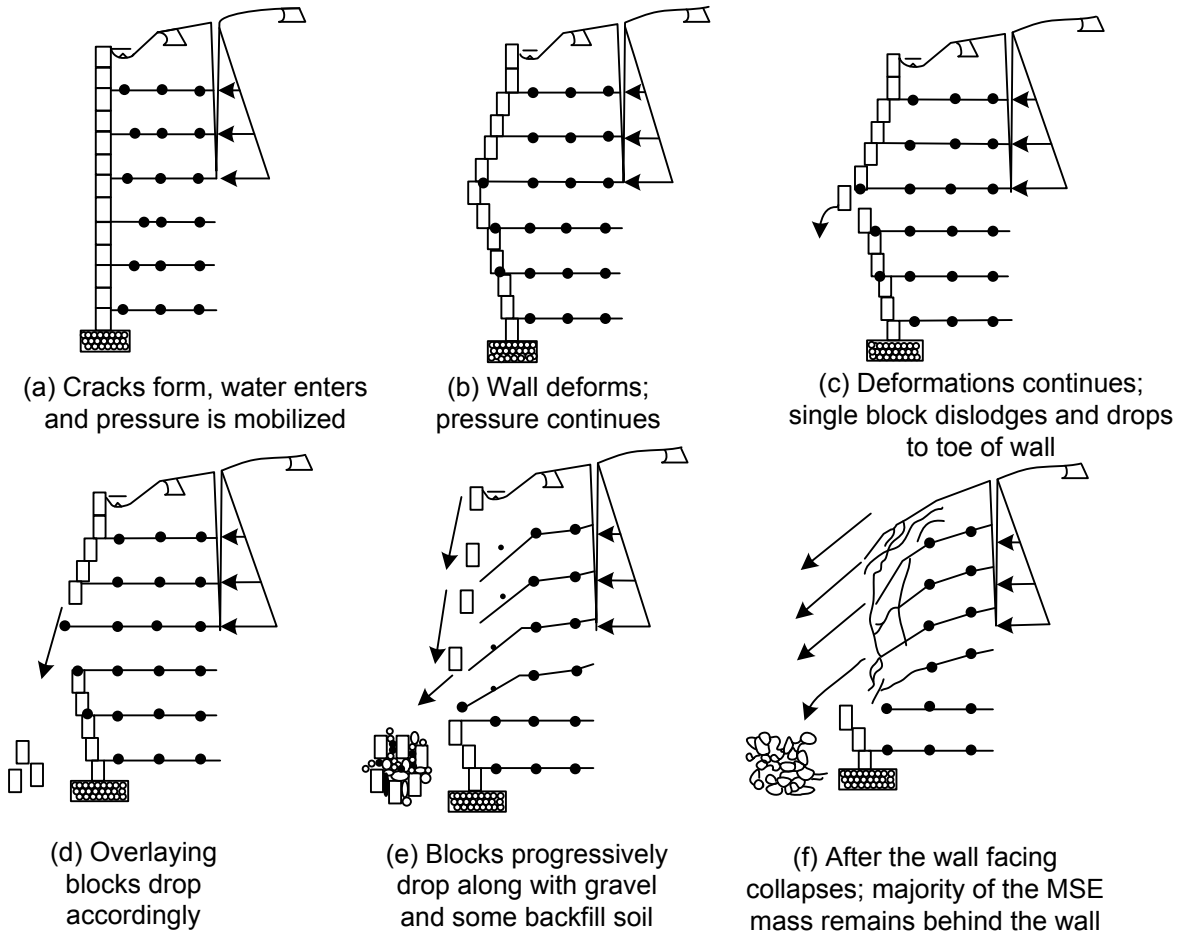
Modular block wall collapse due to hydrostatic pressures in the tension cracks (Koerner & Koerner, 2009)
